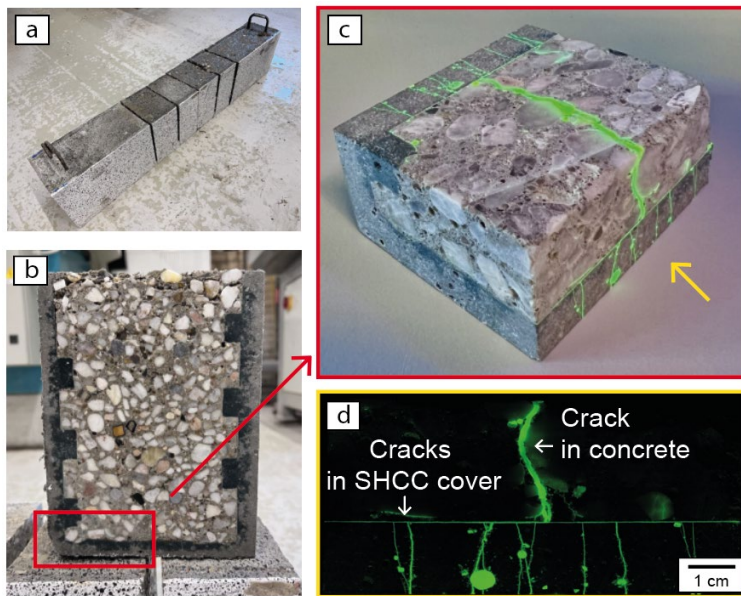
(a) A hybrid beam with mould-cast cover after sawing, (b) cross-sectional image of a section demonstrating the covered system, (c) corner piece cut from the beam section after epoxy impregnation, (d) front surface of the corner specimen under UV light to highlight the crack path.
